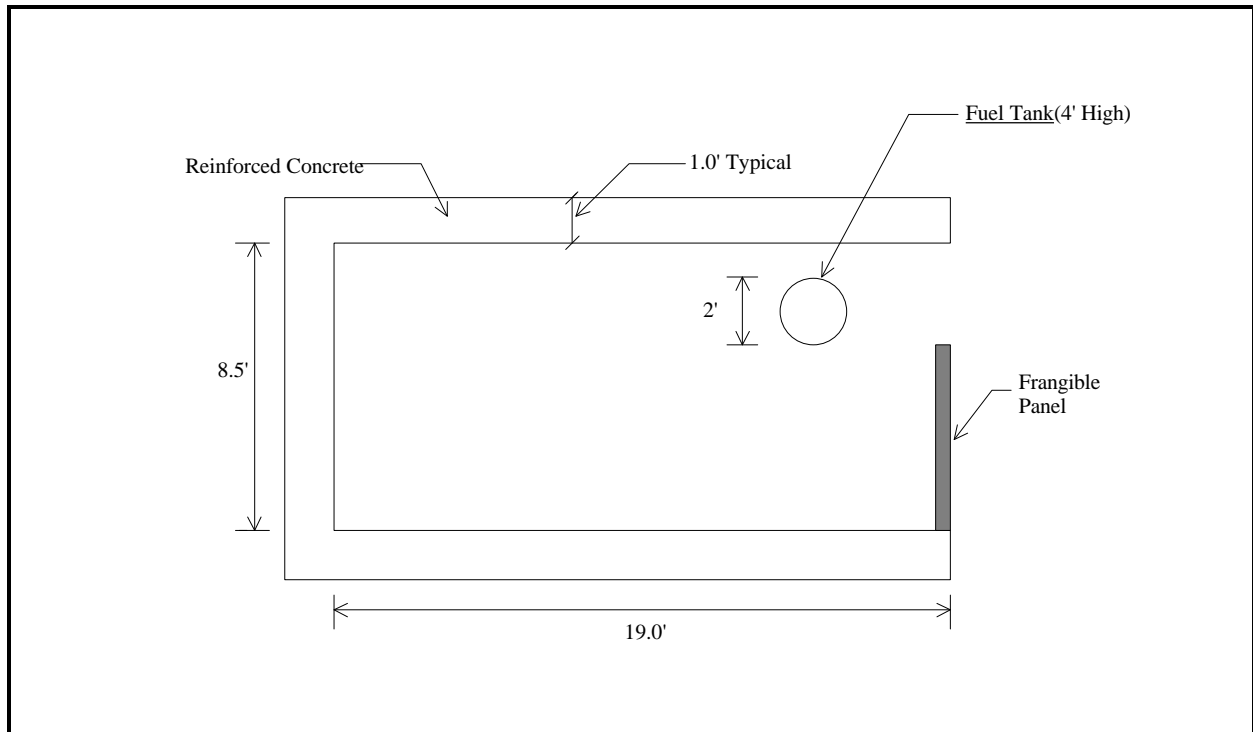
Layout of Otto Fuel Cell and Surround Reinforced Concrete Bay
